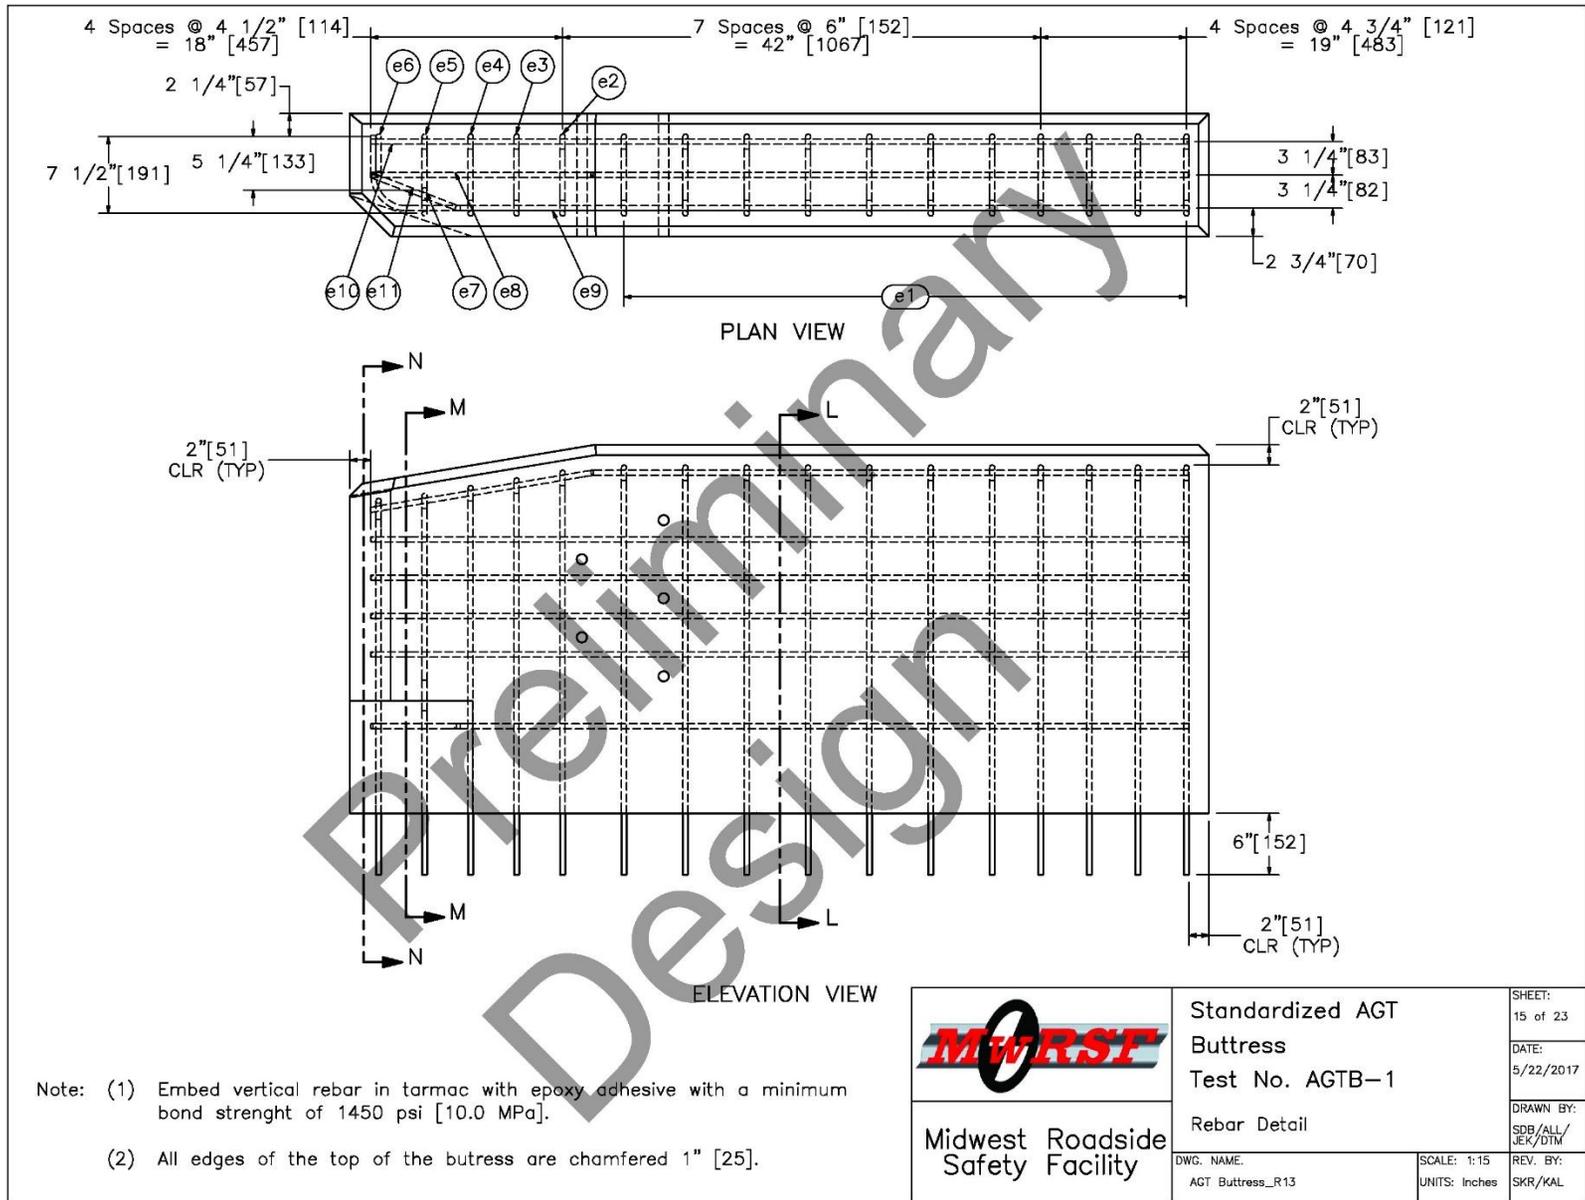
Buttruss Rebar Details, Test No. AGTB-1
